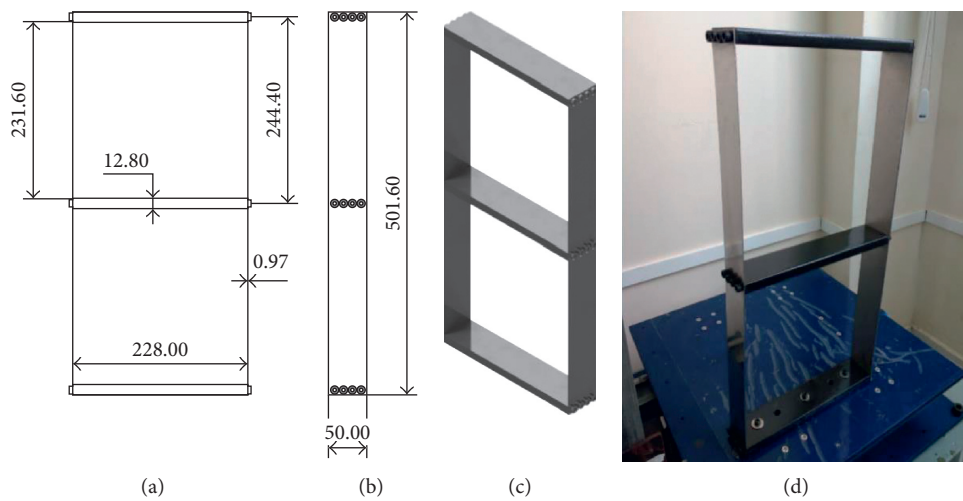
Technical drawing of the prototype. (a) Front view, (b) lateral view, (c) exploded view of the structure, and (d) real model on the shake table.
